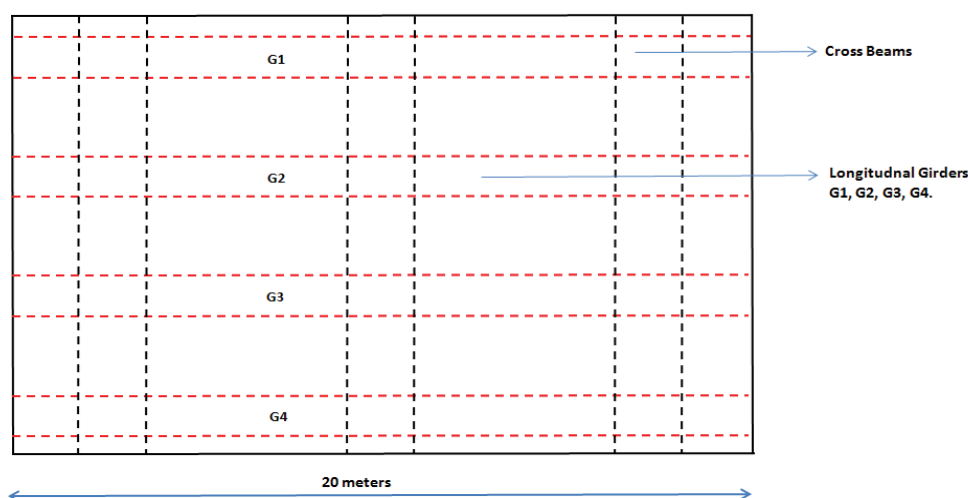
Plan view showing arrangement of cross beam and longitudinal girders [5]
